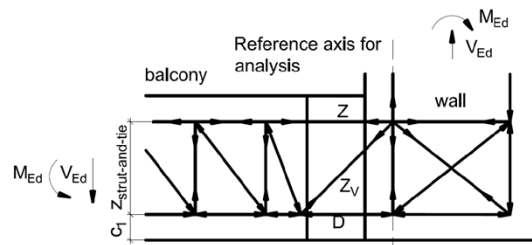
Schöck Isokorb® Type K-U and K-U-F with connection to wall
